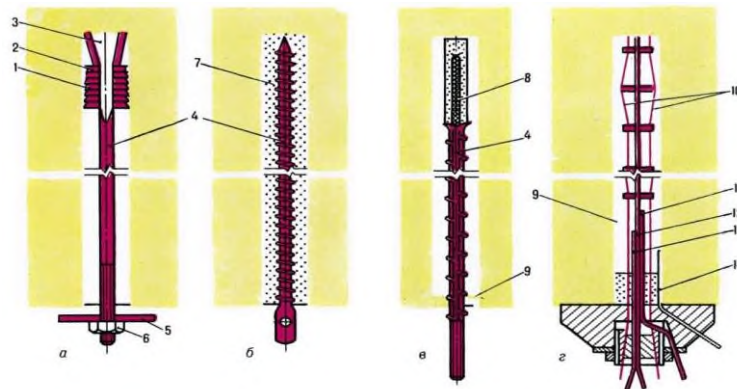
Scheme of installation in the well of expansion (a), stuffed (b), polymer concrete (c) and prestressed (d) anchors: 1 - wire ring; 2 - spacer sleeve; 3 - wedge; 4 - rod; 5 - base plate; 6 - nut; 7 - cement mortar; 8 - ampoule with resin, sand and hardener; 9 - sealing ring; 10 - bundle of high-strength wire; 11 - tube for secondary injection of the solution; 12, 13 - tubes for solution and air outlet; 14 - tube for the primary injection of the solution.
